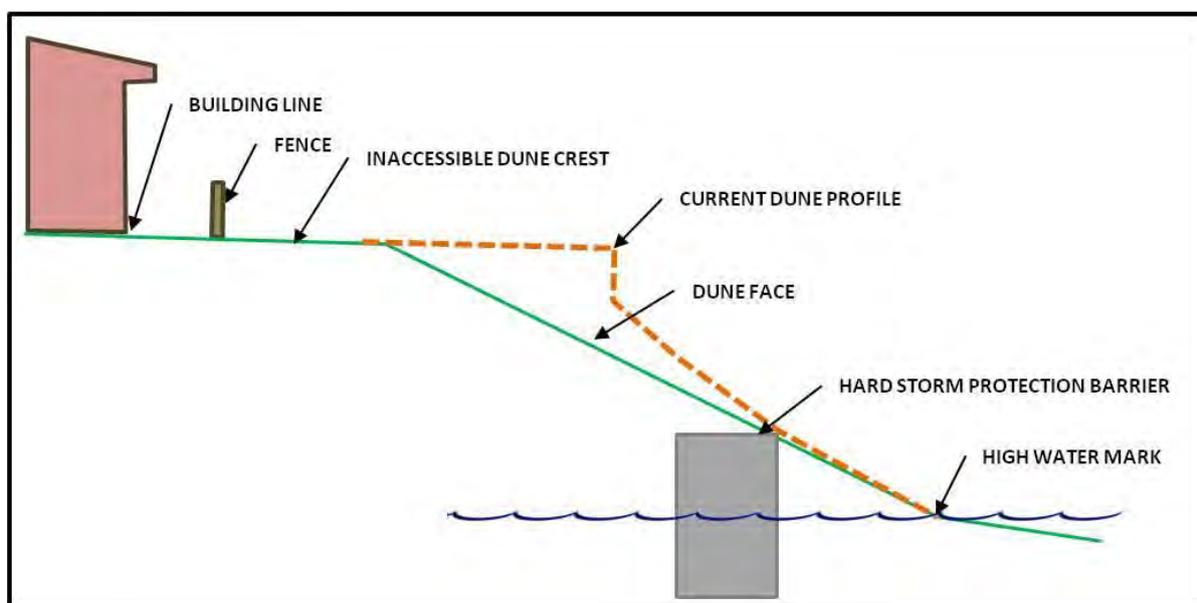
Submerged storm protection barrier proposed for Leentjiesklip Caravan Park (Common Ground Consulting 2013b).
